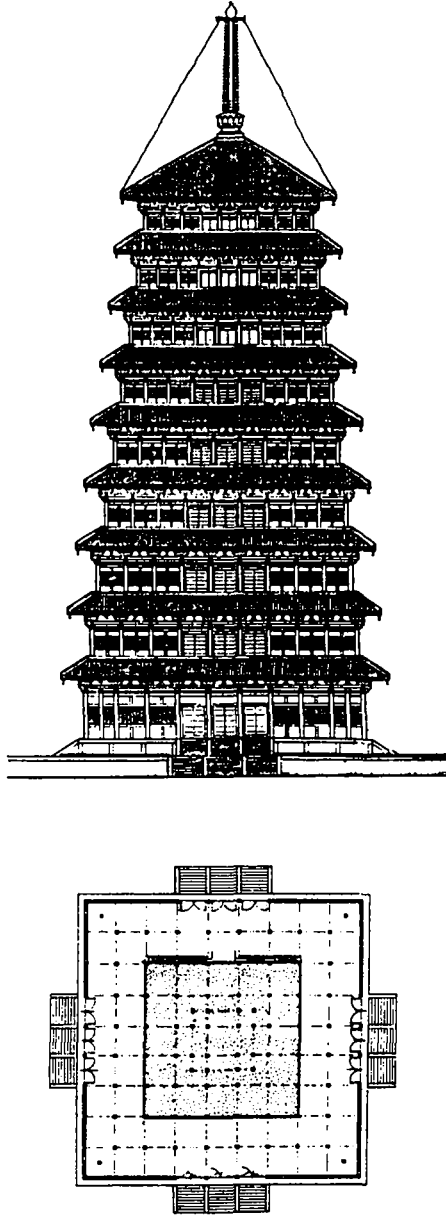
Reconstructed ground plan and elevation V of the pagoda of Yongning-si 永寧寺 영녕사 in Luoyang 洛陽 낙양 (516 AD, scale: 1 : 1,000) (after: *JAH* 12, p. 158)
